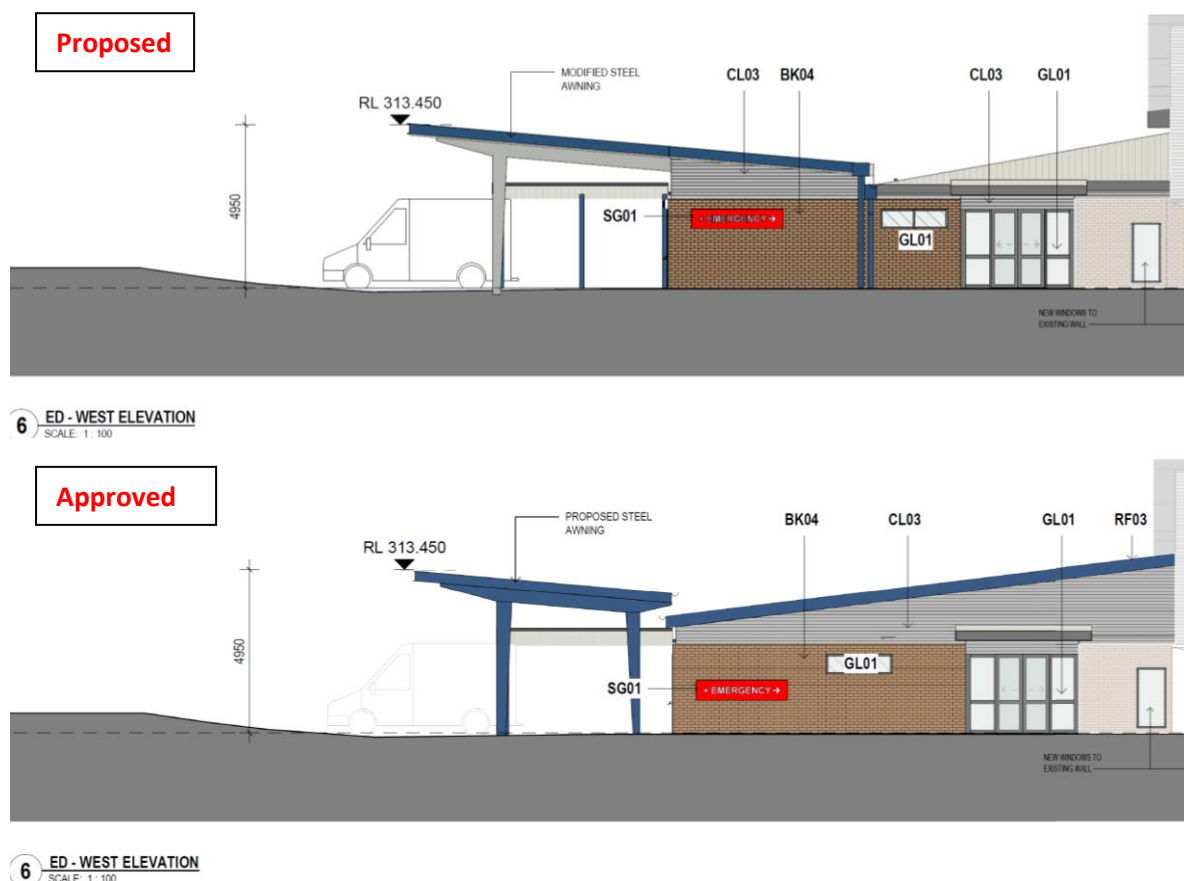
Proposed (above) and approved (below) west elevation of the ED extension and ambulance bay roof (STH)
